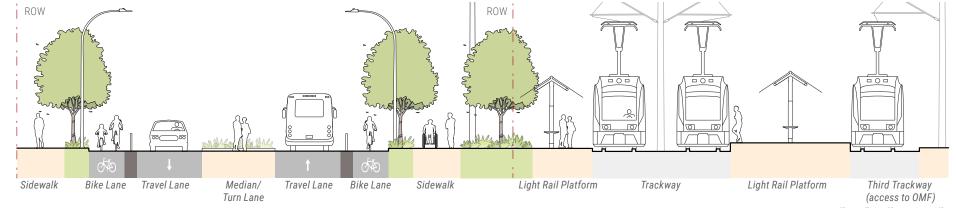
DRAFT Hall Boulevard Station Cross Section
